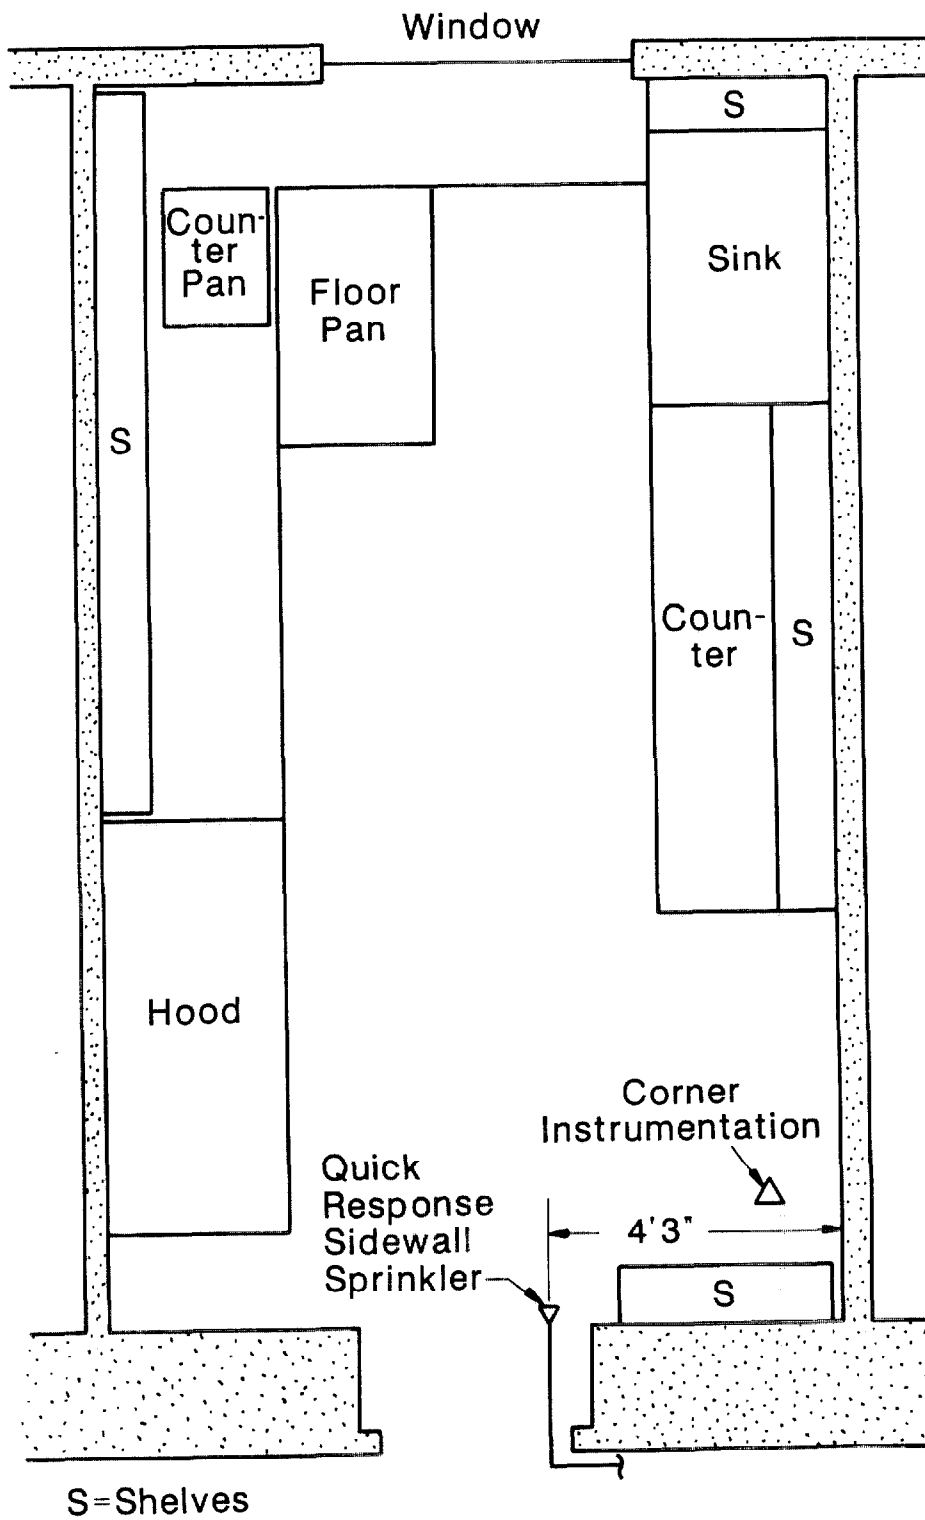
Laboratory plan for test with quick response sidewall sprinkler
